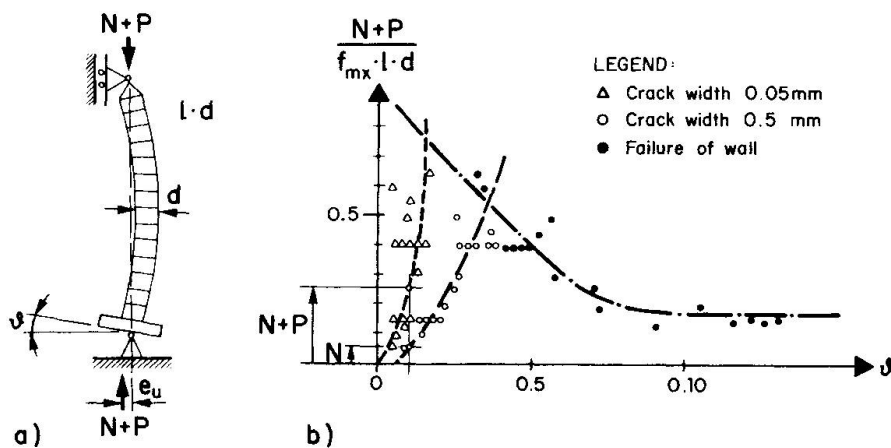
Influence of prestressing on crack width in masonry walls:
